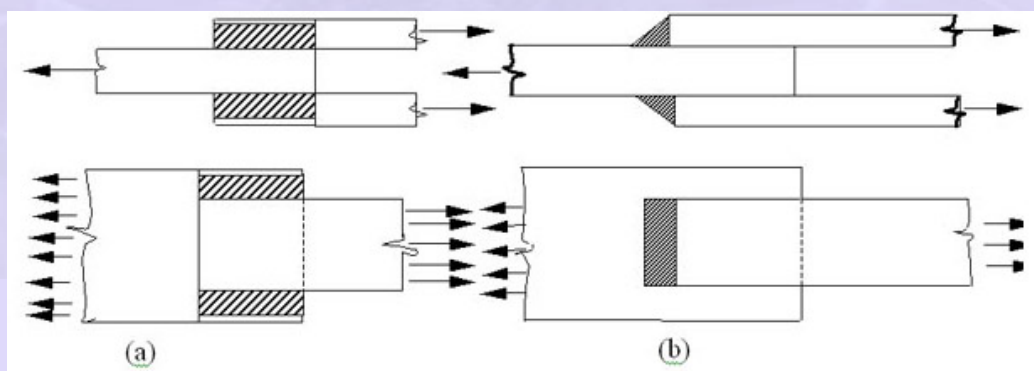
Fillet (a) side welds and (b) end welds
